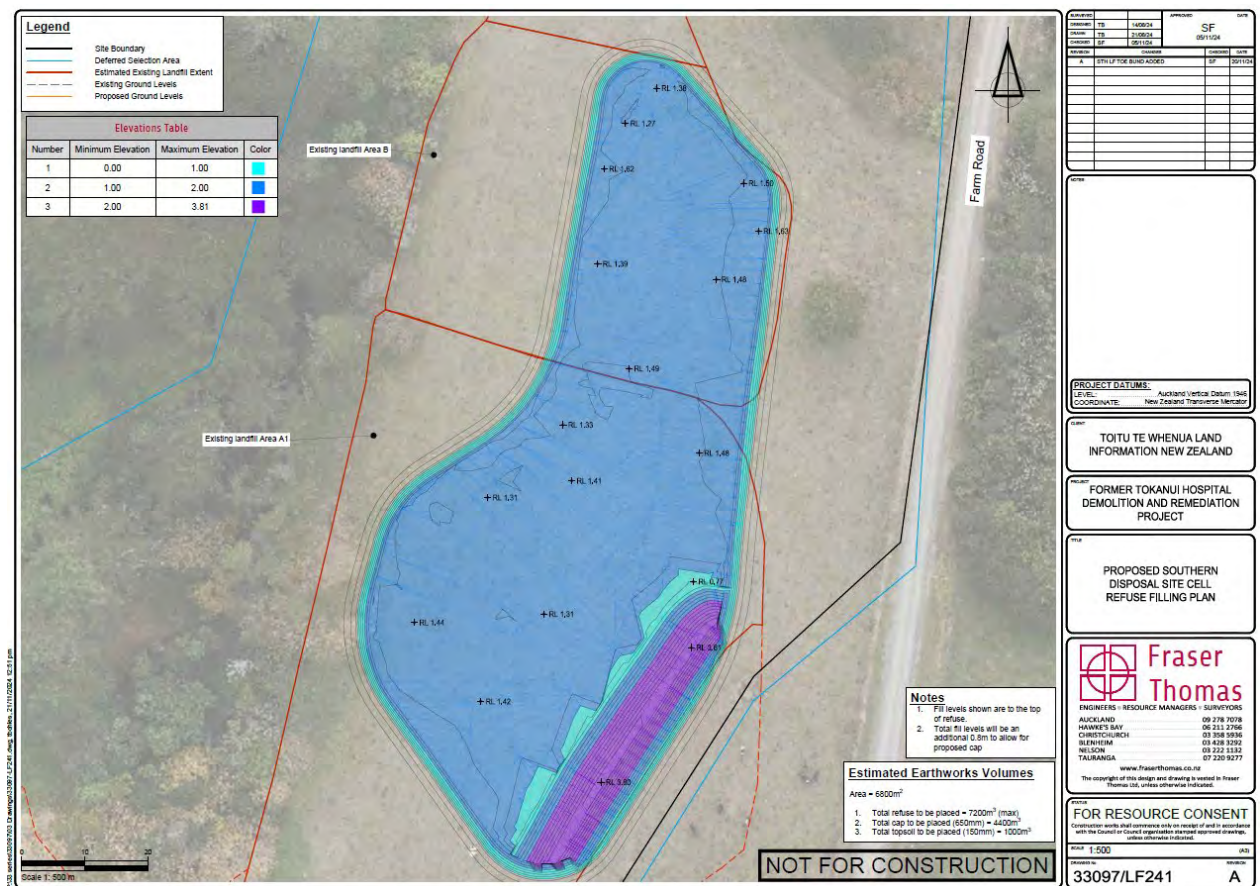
Proposed Southern Disposal Site Cell – Refuse Filling Plan
